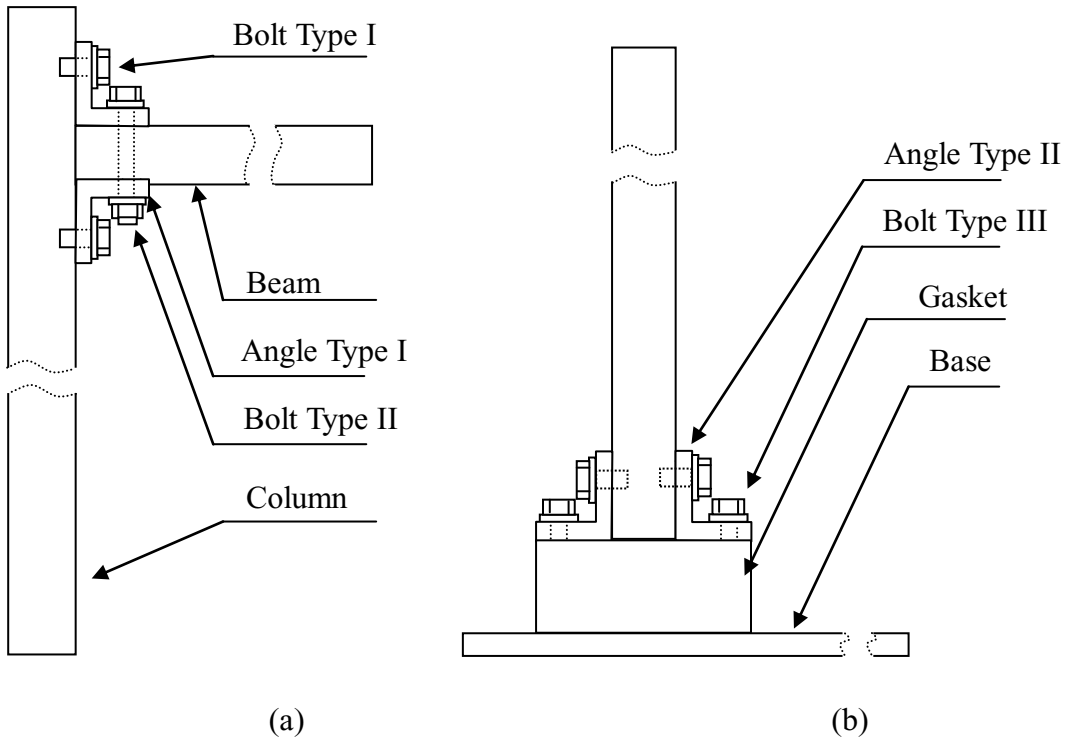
Connections details for (a) beam and column and (b) column, gasket, and base
